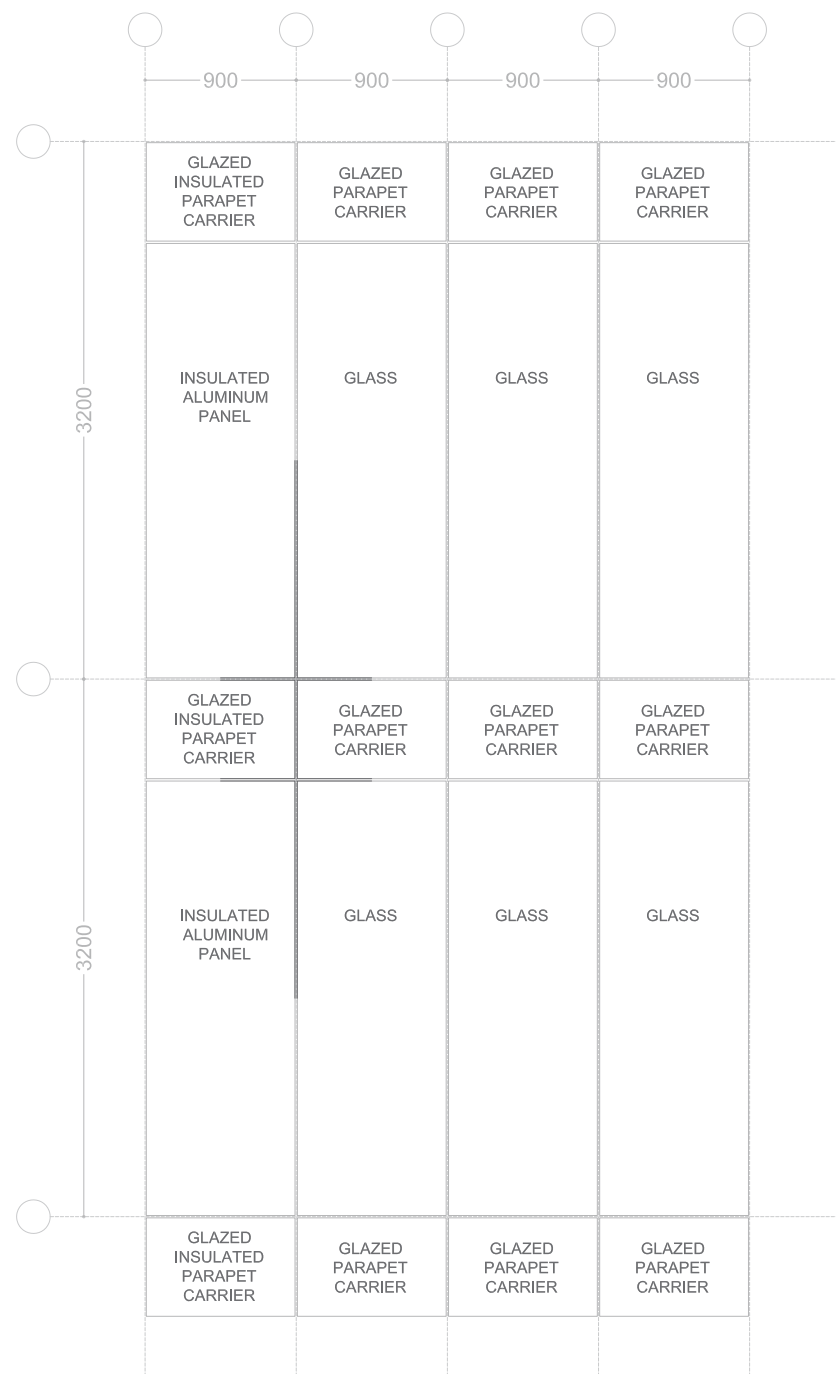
Indicative elevation view of existing curtain wall facade for selected case (Source – Author)
